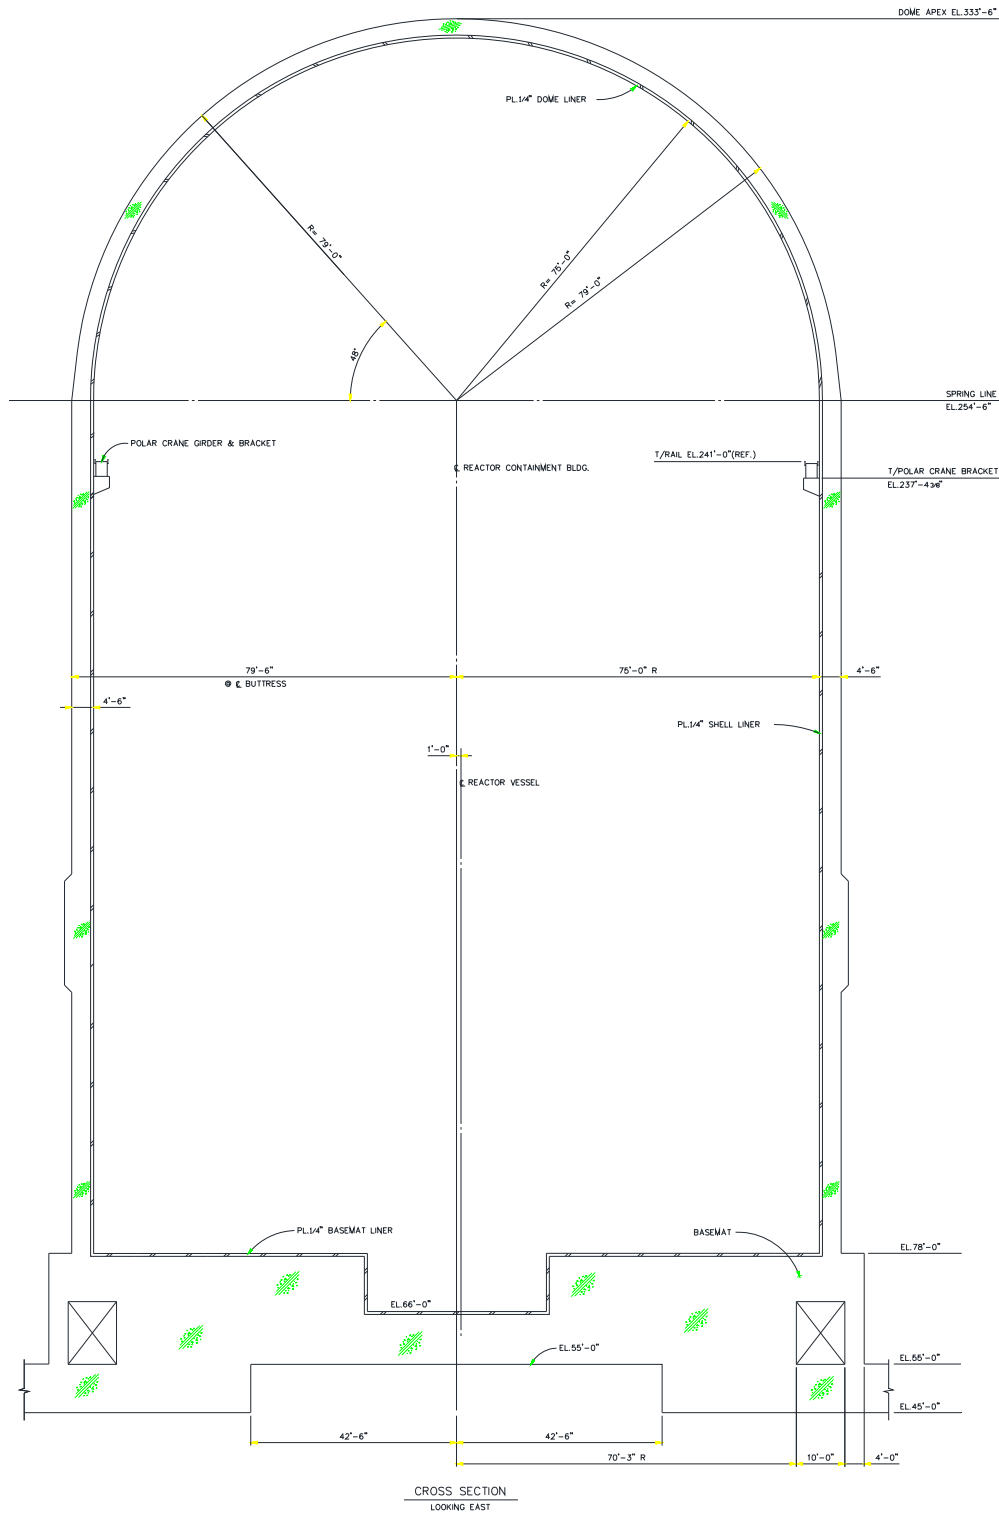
Typical Section of Containment Structures (Looking East)
